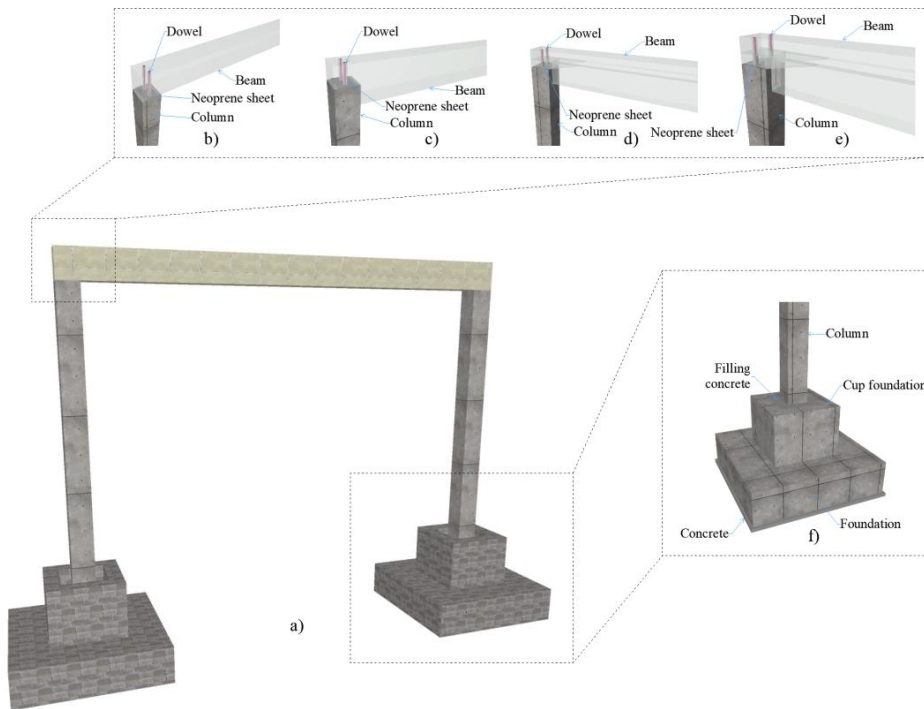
Schemes of the frame a Global model; b Straight-ended beam; c Notched-ended beam; d “T” cross section with notched end; e “T” cross section with “pocket” end; f cup foundation-column connection
